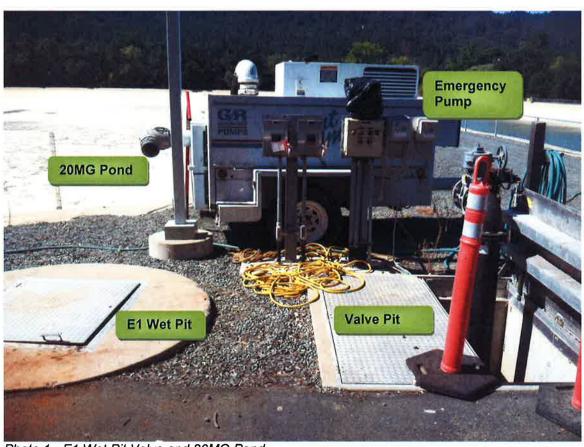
E1 Wet Pit Valve and 20MG Pond
